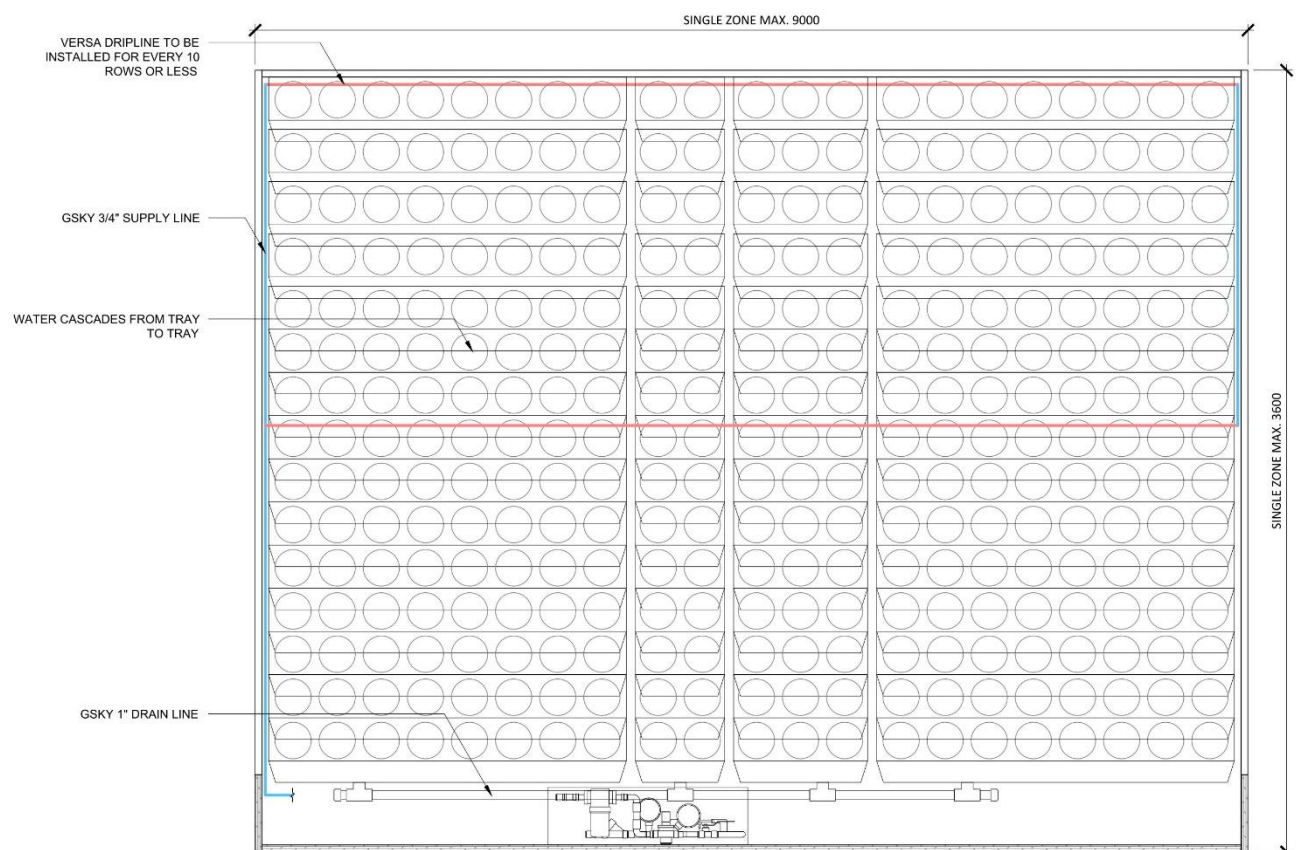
Versa Wall Above the Floor/ICU Below Wall VTI-70 Elevation. Versa Wall CAD & Specs. (2020, March 2). Retrieved from <https://gsky.com/versa/cad-specs/>
